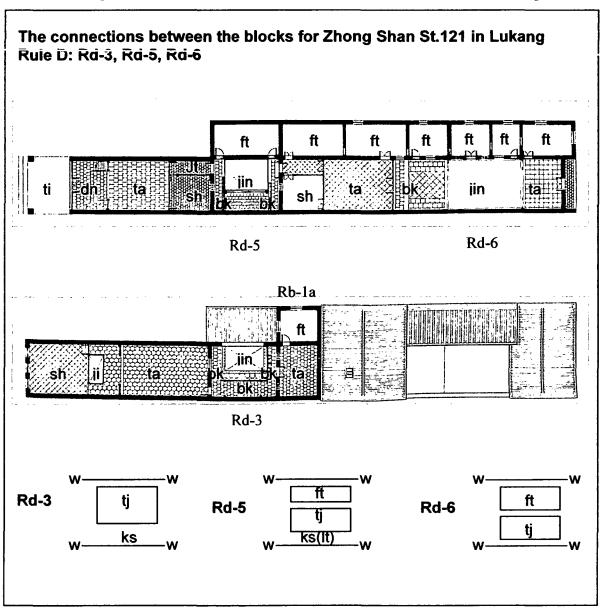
29 Rule D to illustrate the connections between blocks of floor plans at Zhongshan St.121 in Lukang
